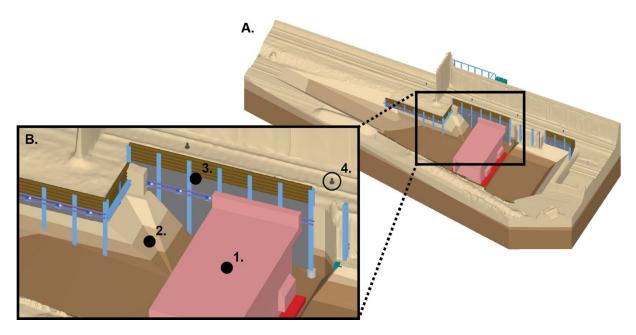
Combined representation of the geological model with the construction elements in Basel Muttenz. Digital construction model of all geotechnical construction elements for temporary excavation support (A). The enlarged section (B) shows the prefabricated pedestrian subway before insertion (1), the geological formations on the excavation pit wall (2), the soldier pile walls and the tensioned anchorages (3) and the measuring points of the plate bearing tests (4).
